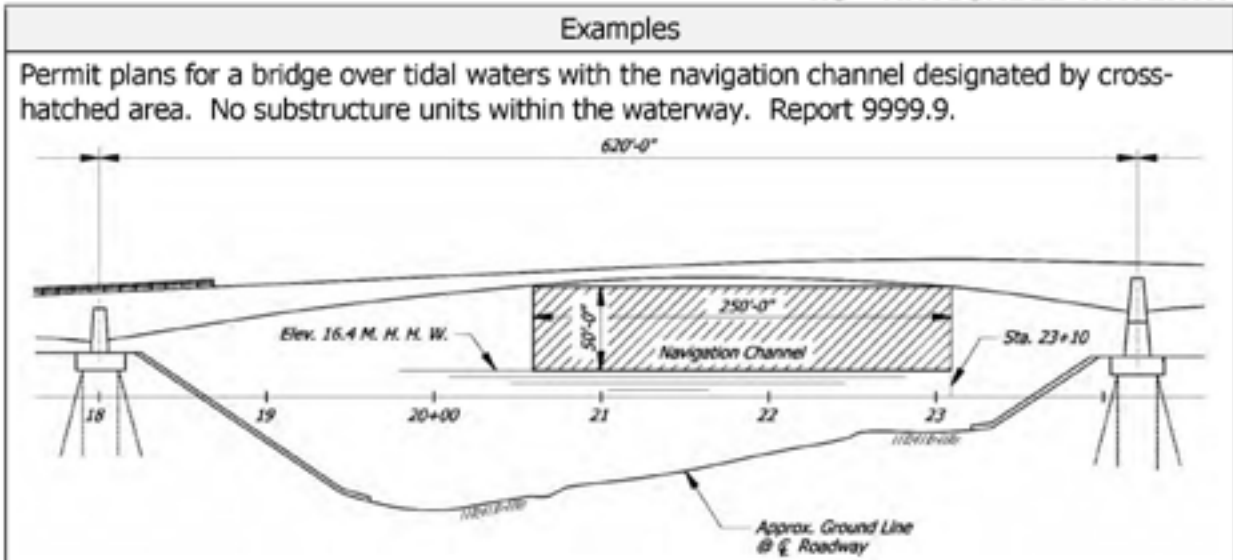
Bridge elevation view with no substructure units in the waterway. (Source: Alaska DOT)
